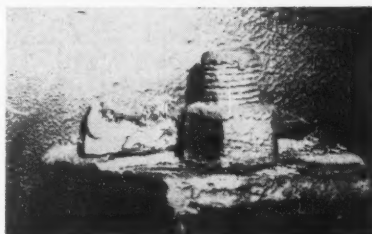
Lug bolt assembly at bottom of actifier tower Section 27 suffered loss of adhesion and edge corrosion. See Table 1 for coating used.
